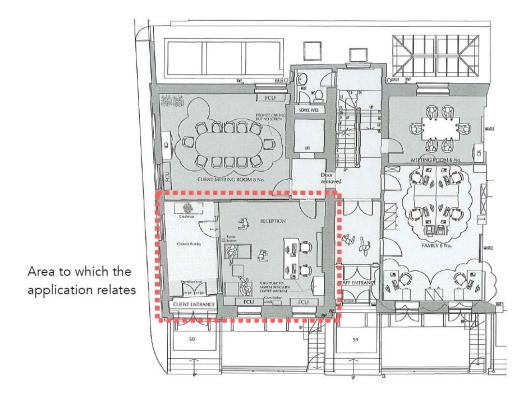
Floor plans of nos. 59-60 Russell Square dated 1981 showing the layout of the ground floor in the early-1980s (Source: Camden Archive).
